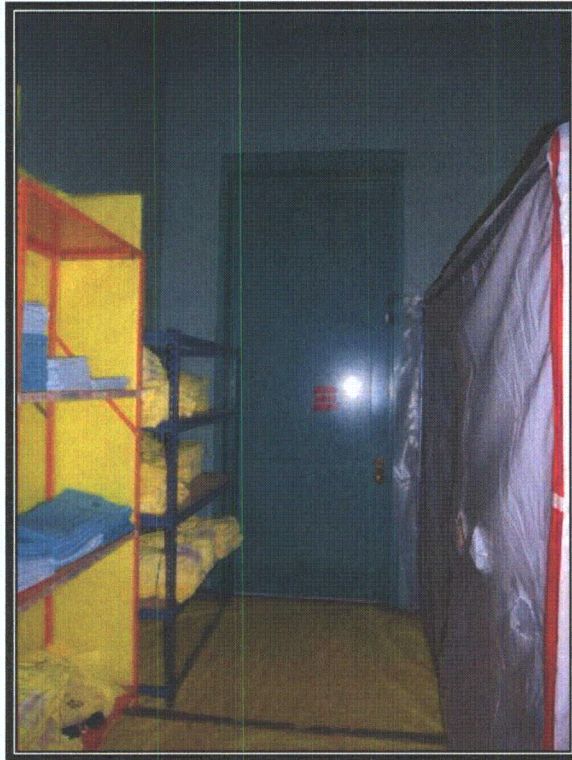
Over-height door leading to new fuel storage room (Photograph by RCG&A, 2008)
